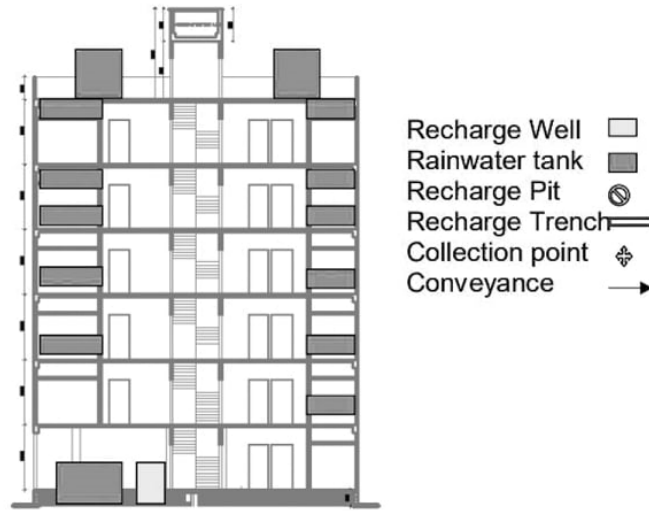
Design of RWH for non-potable use using Over Toilet Storage (OTS) space as rainwater storage
